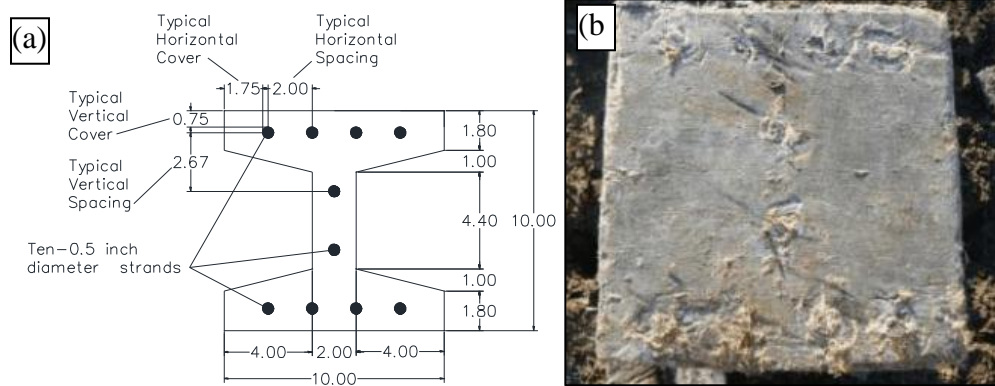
a) Cross-Section of UHPC Pile; and b) Top 18-in. of Test Pile
